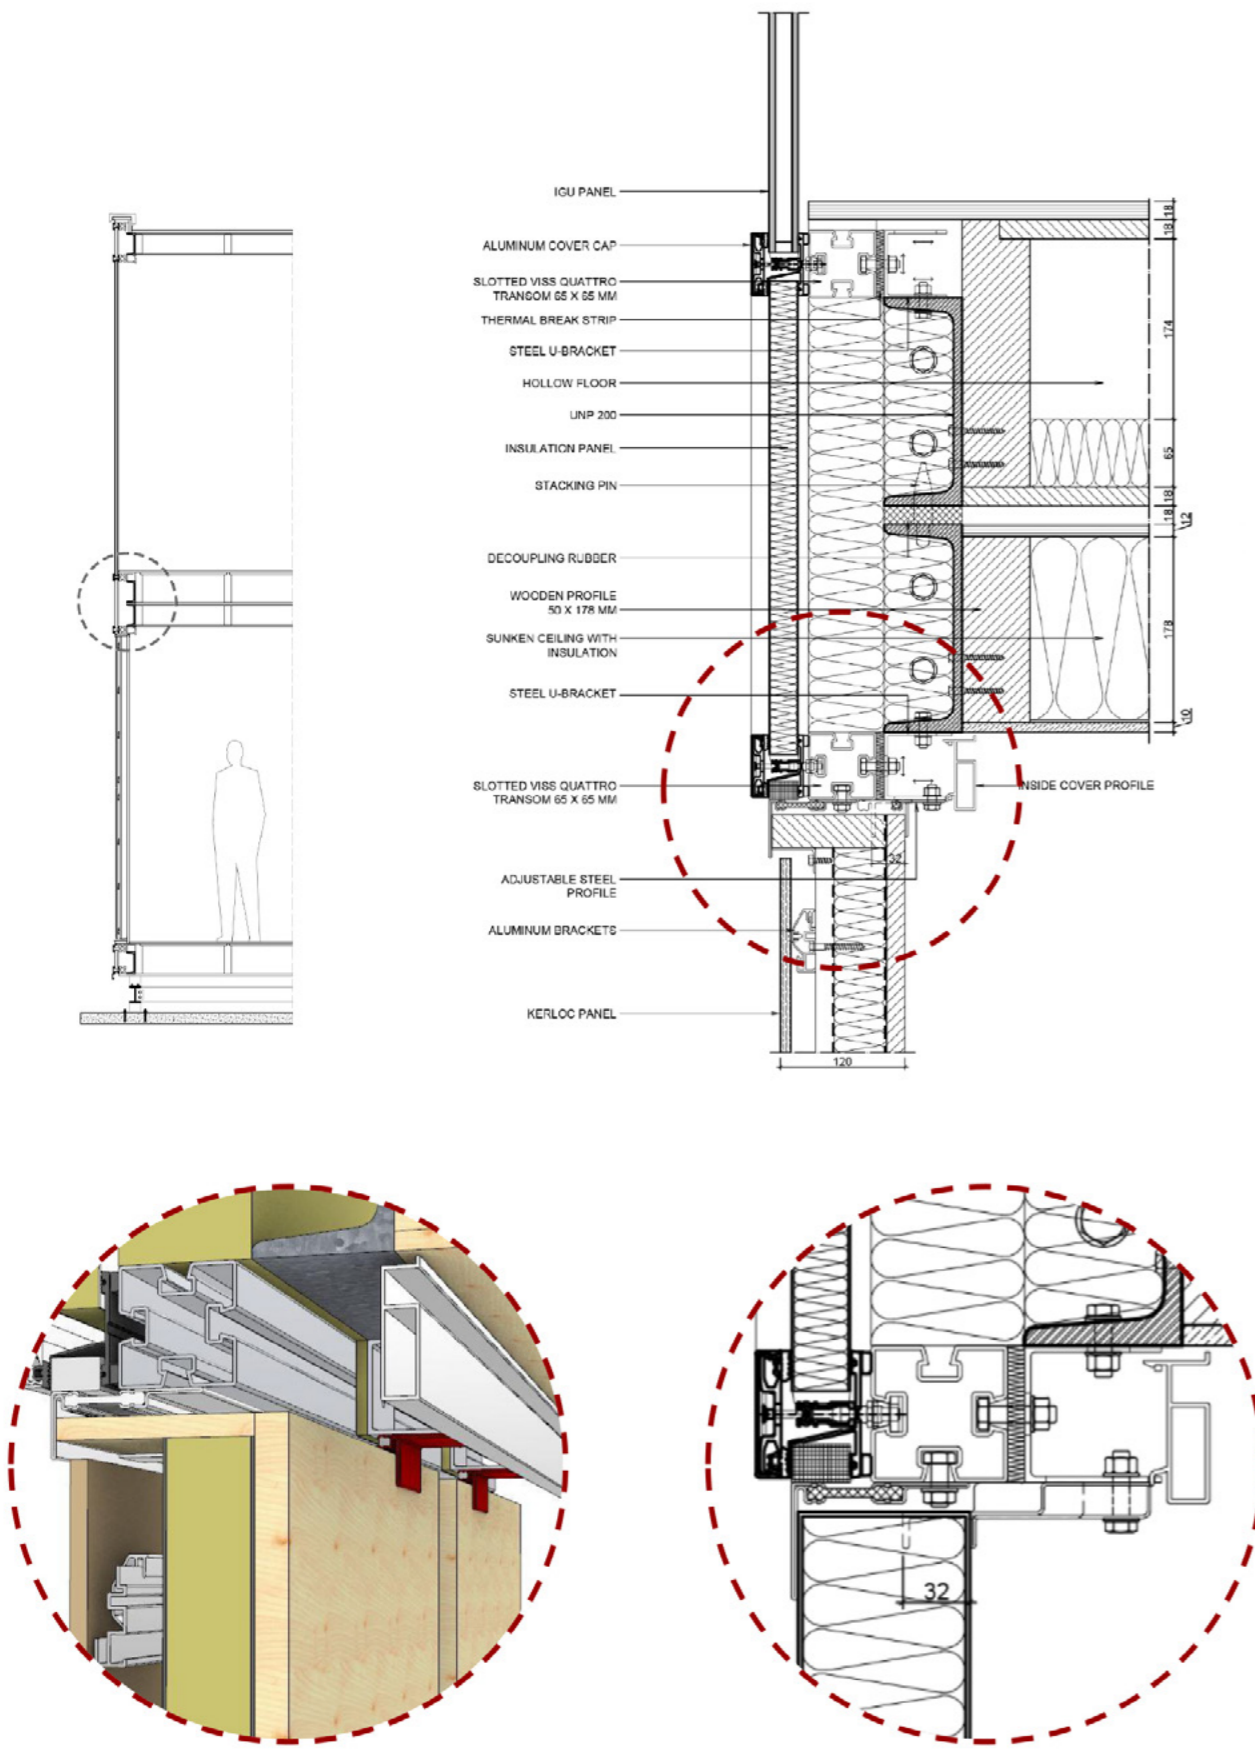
Façade section through floor and ceiling (Source: Author)
